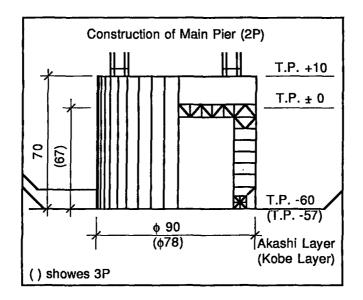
MAIN PIER FOUNDATION (in meters)
